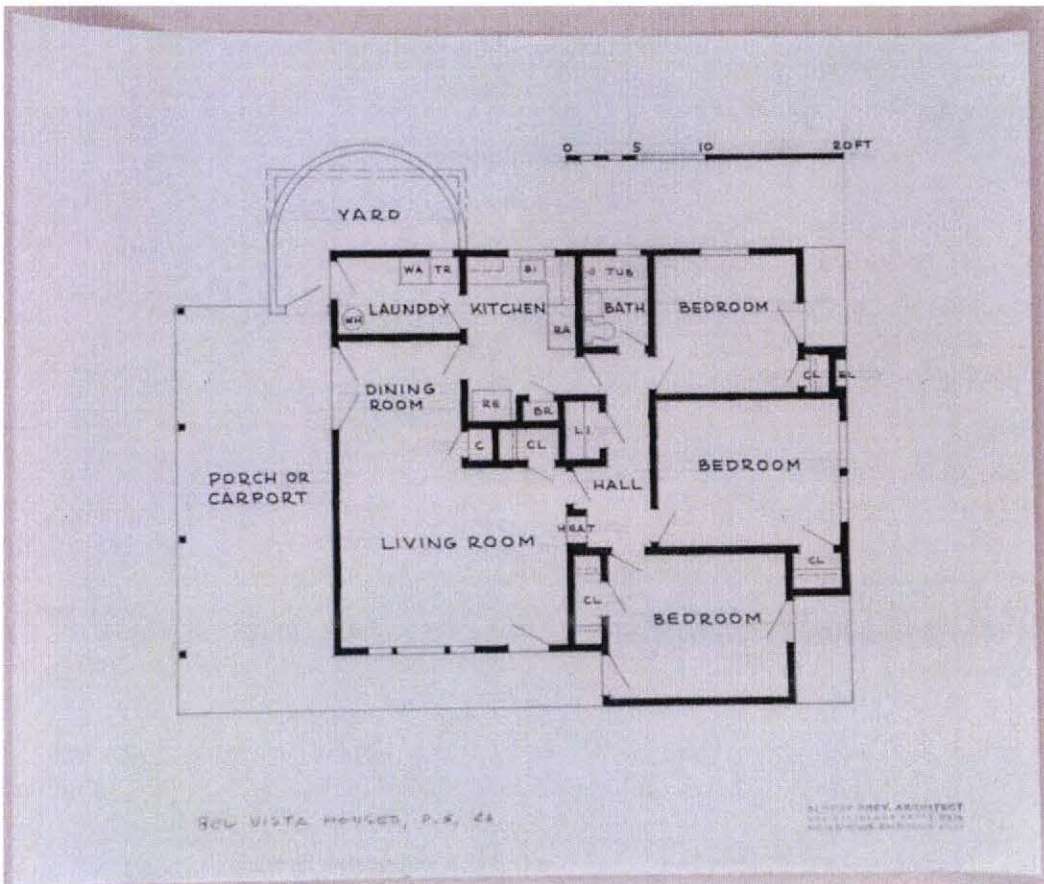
, Original floor plan. Source: Art, Design & Architecture Museum, University of California, Santa Barbara
